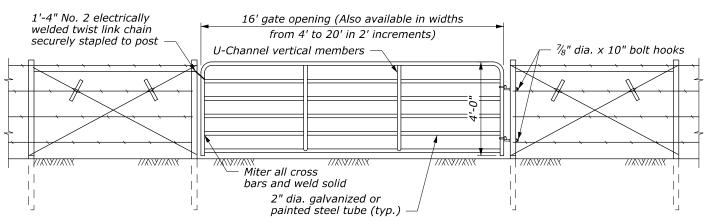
DETAIL APPROVED FOR USE 2/2010 DETAIL WM619-60
